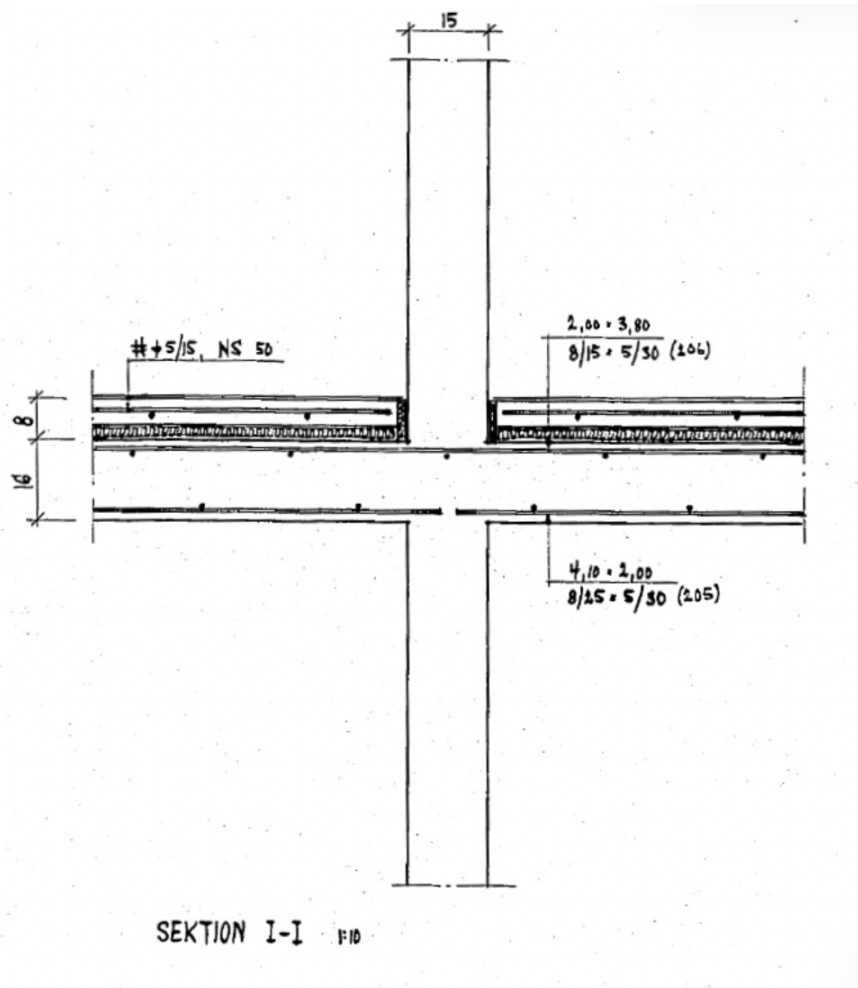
Section drawing of a cast in situ concrete floor and load-bearing wall in Cykelskrapan, Lund, dated 1956.
